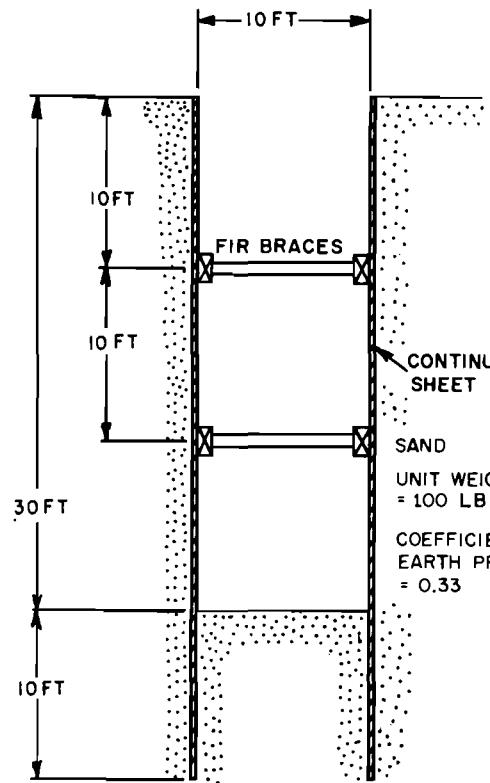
shows a braced trench that is 120 inches wide. The trench is lined with continuous sheet piling, with wales arranged so that the soil pressure on each five-foot length of trench is transferred to timber struts located at the third points of the trench depth. The applied lateral soil pressure is assumed to be as shown in Fig 15b, and the restraint provided by the toe of the sheet piling is simulated by a series of springs whose stiffness varies in simple proportion to depth. For the beam-column solution, the sheet piling was divided into 40 twelve-inch increments.
